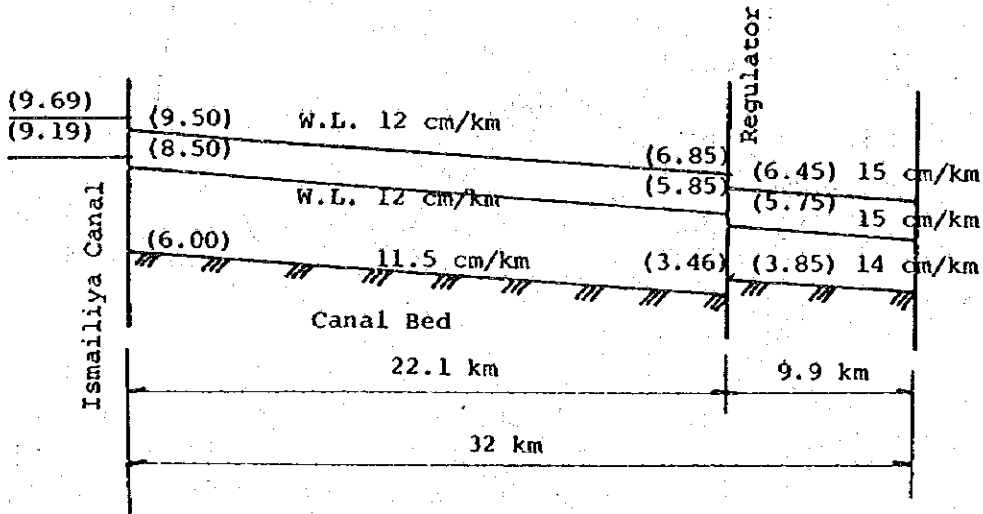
SCHEMATIC PLAN OF SALAM CANAL
